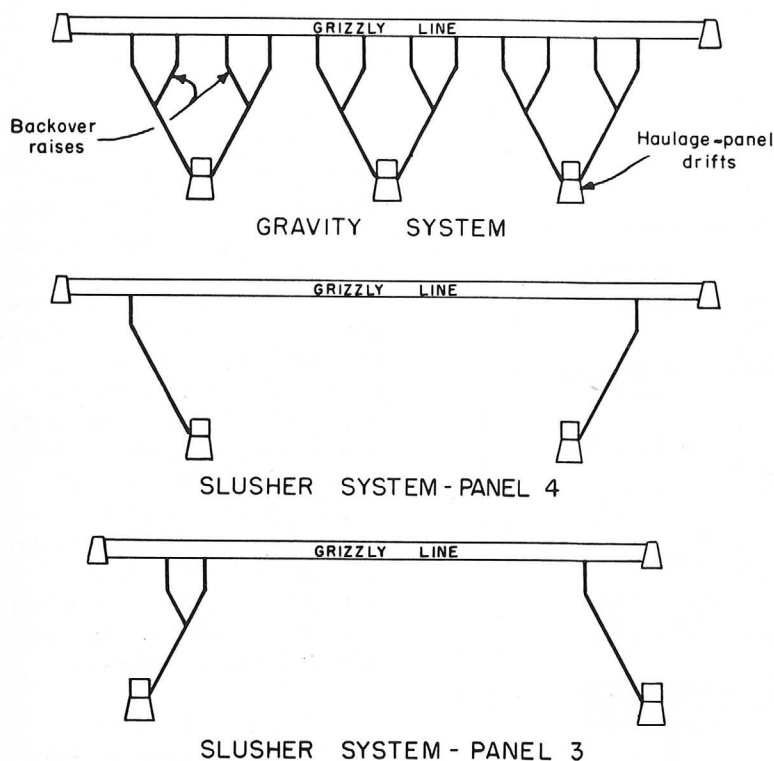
Schematic Sections Contrasting Development of Gravity and Slusher Blocks.
